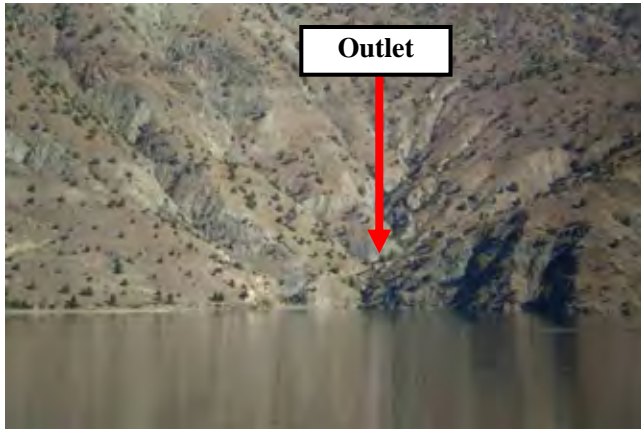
Creeping rock mass in the outlet site on the right bank of Gökçekaya lake
